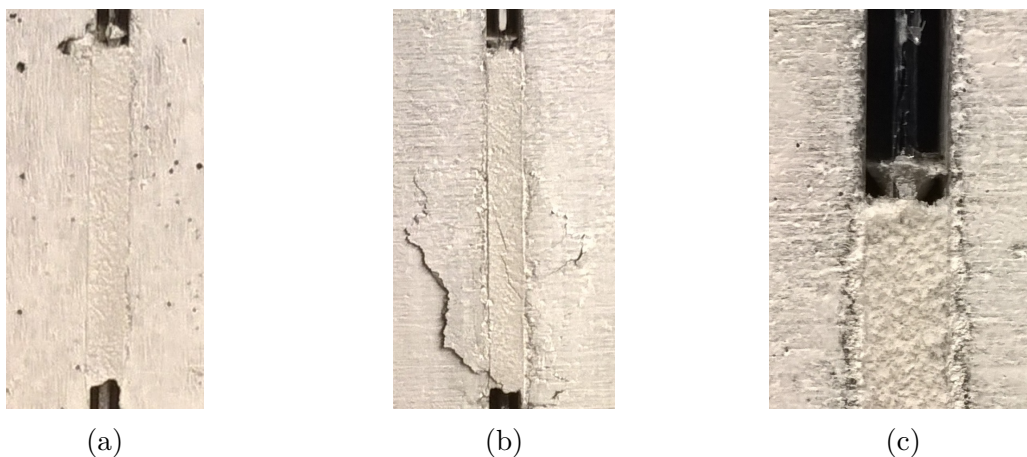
Failure modes obtained in the direct pullout tests: (a) clean failure at FRP/adhesive interface (F/A); (b) mix failure at FRP/adhesive interface and within concrete (F/A+C); (c) loaded end section zoom.
